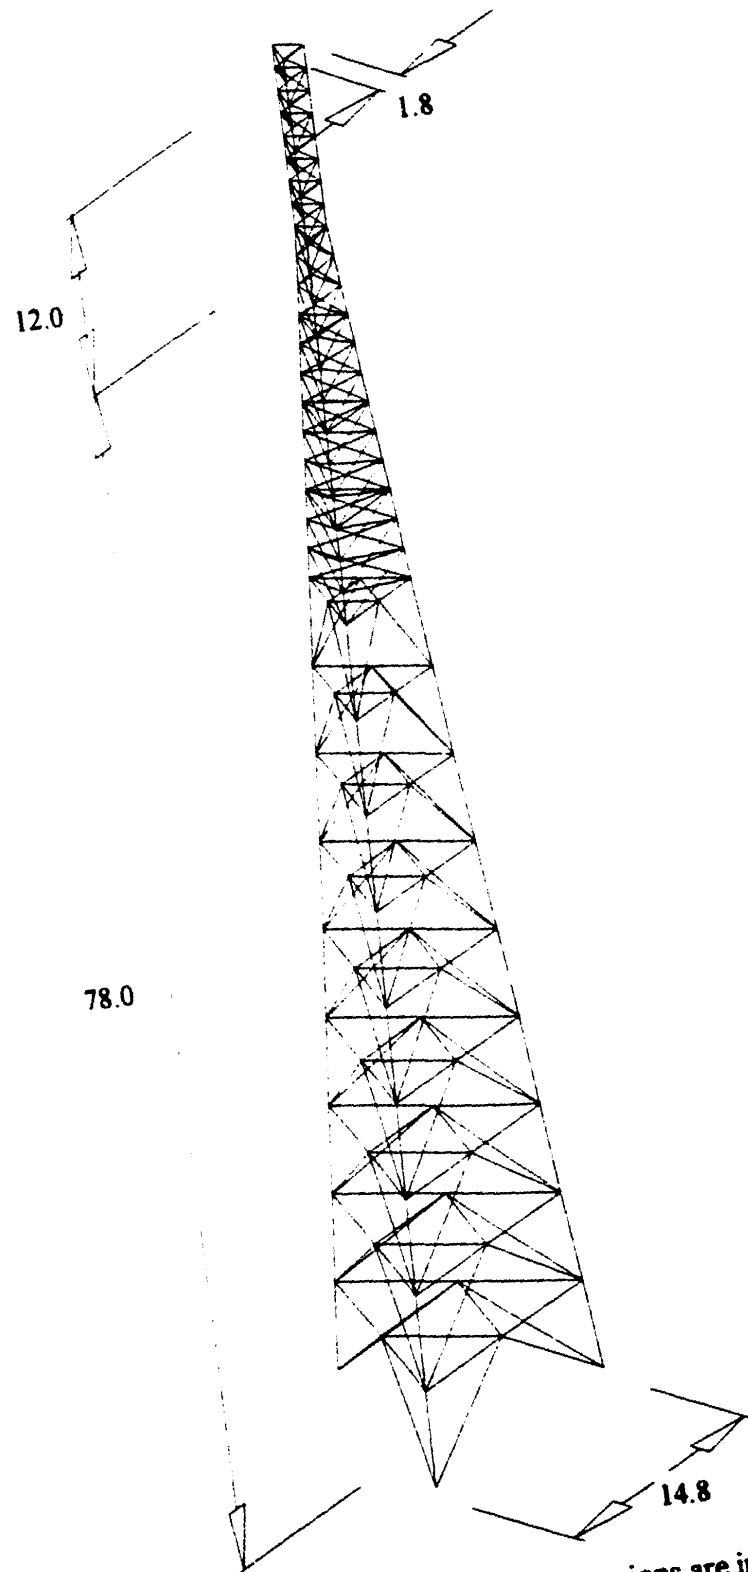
Layout of tower TC6 (dimensions are in m)
